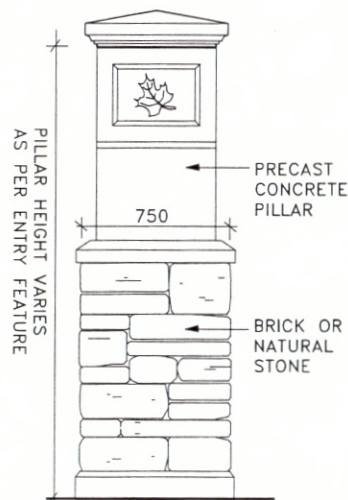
ELEVATION OF PRECAST CONCRETE AND NATURAL STONE PILLAR FOR ENTRY FEATURES N.T.S.
